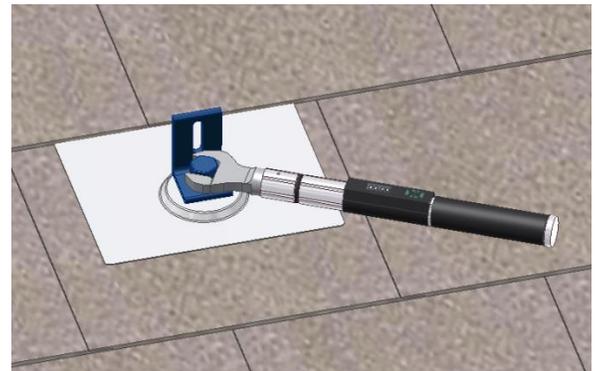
Install the L-Foot and Aluminum hex cap and tighten to 15 ft. lbs.
